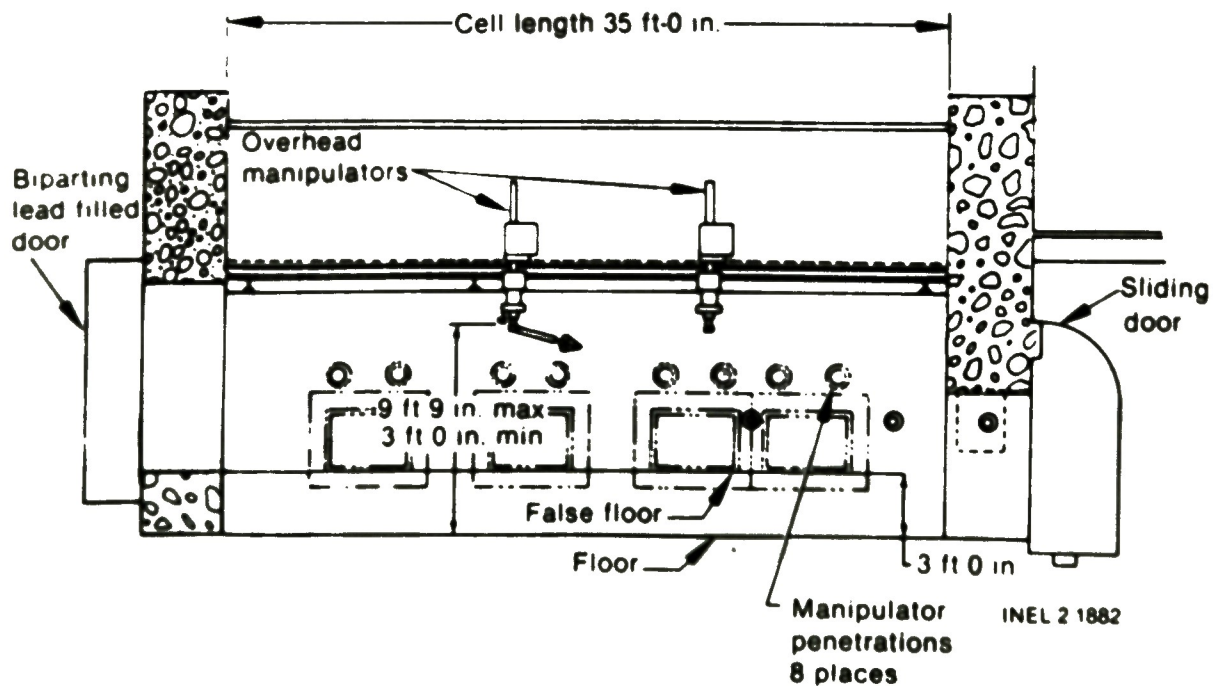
Elevation view of TAN Hot Cell, showing handling equipment.
